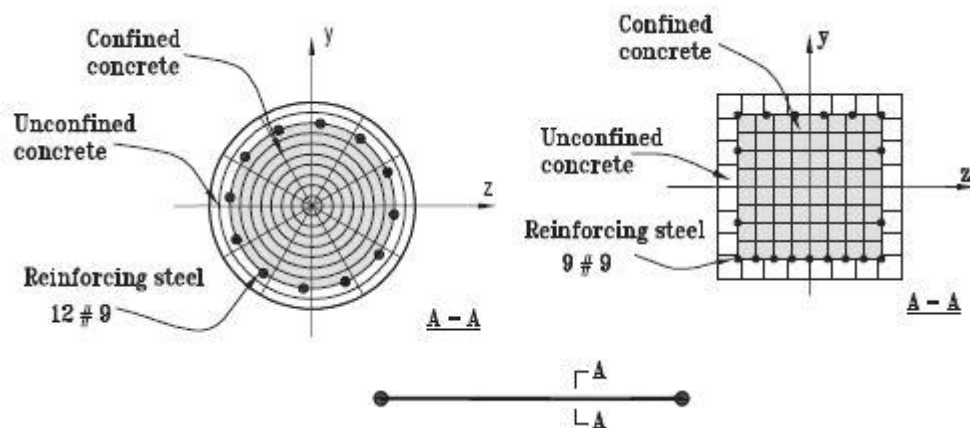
Nonlinear beam-column element with fiber section ((Siqueira et al., 2014)
